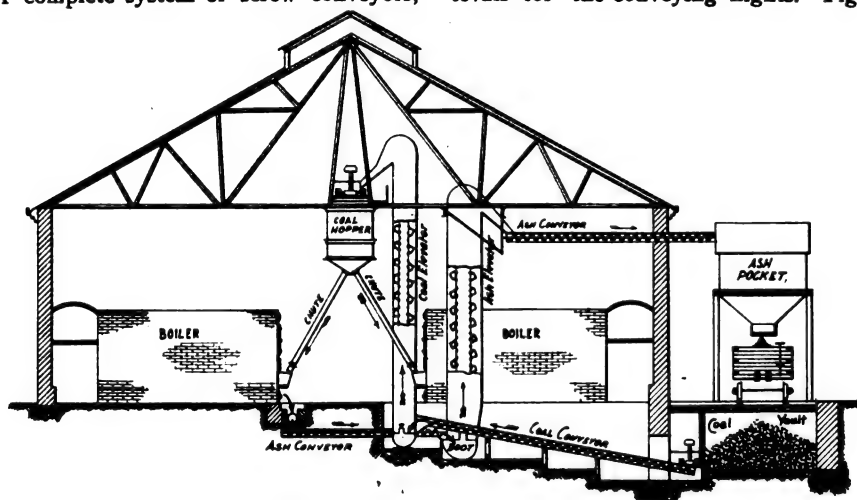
ARRANGEMENT OF POWER HOUSE COAL AND ASH-HANDLING PLANT.
